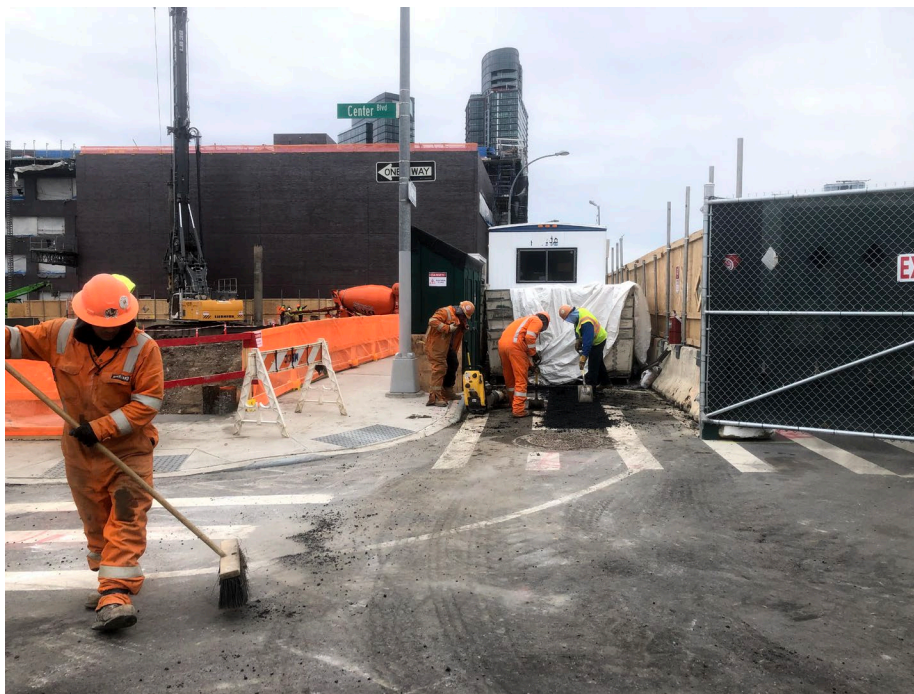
Looking southeast, MEEC leveling asphalt after completing electrical work.
